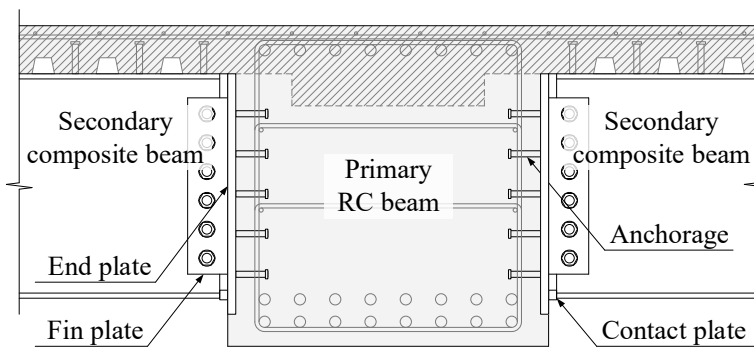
Beam-to-beam joint with primary reinforced concrete beam
